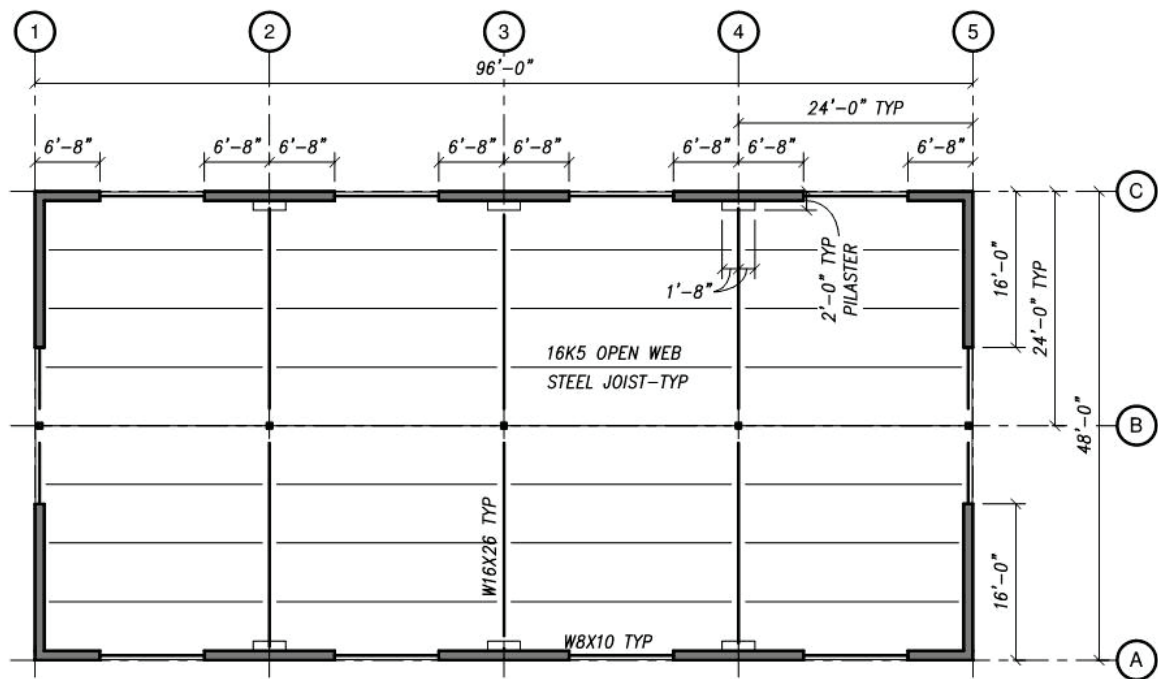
Four-story commercial building roof framing plan: COM 6.
